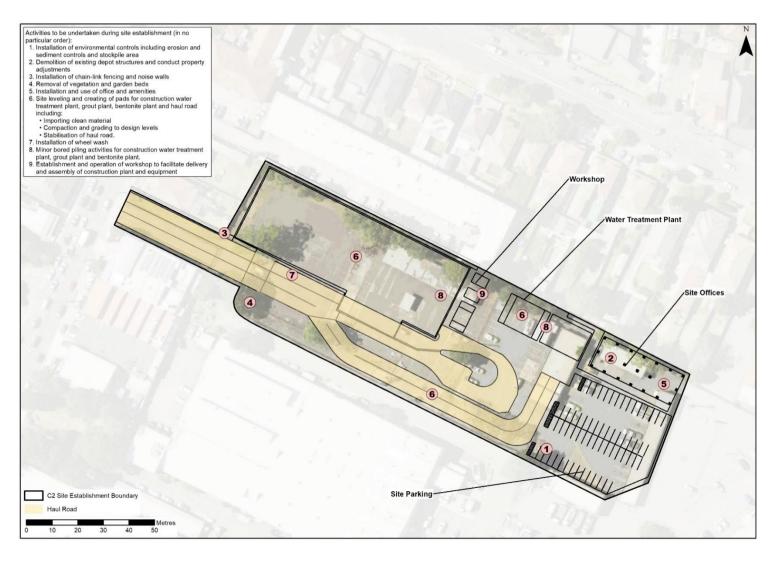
Preliminary construction at Rockdale Depot construction ancillary facility (C2)
